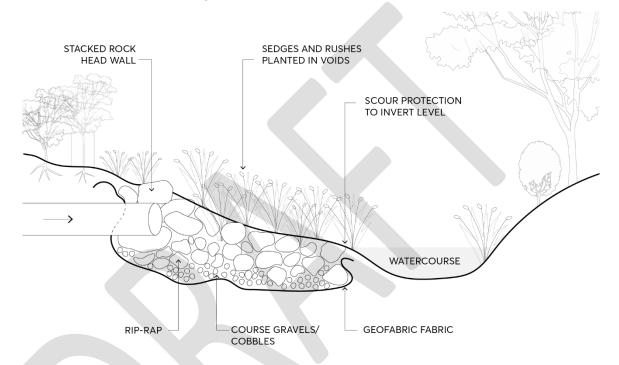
Stormwater outlets into natural waterways
